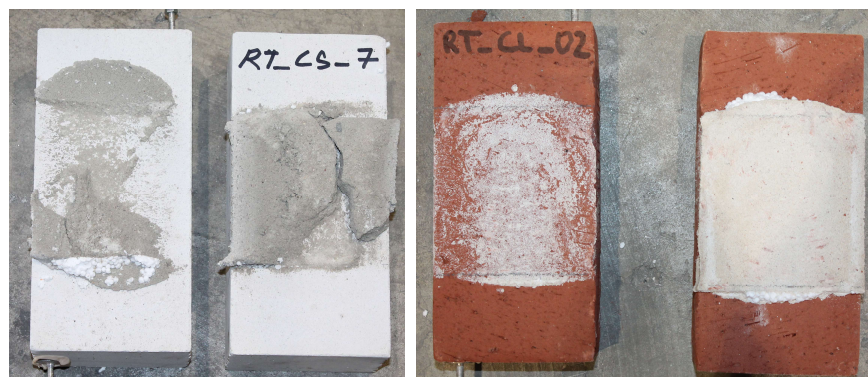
33: Failure modes observed for CS (left) and clay (right) masonry doublets in the laboratory.
